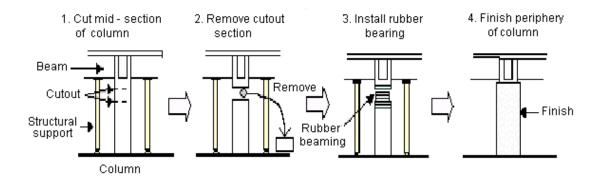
Base isolation improvement procedure for first floor columns (1) to (4)
